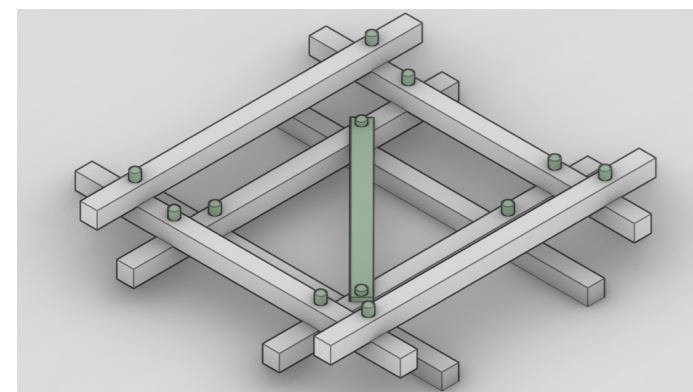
Placing orthogonal beams horizontally with dowels and diagonal bracing (Own work, 2024)
